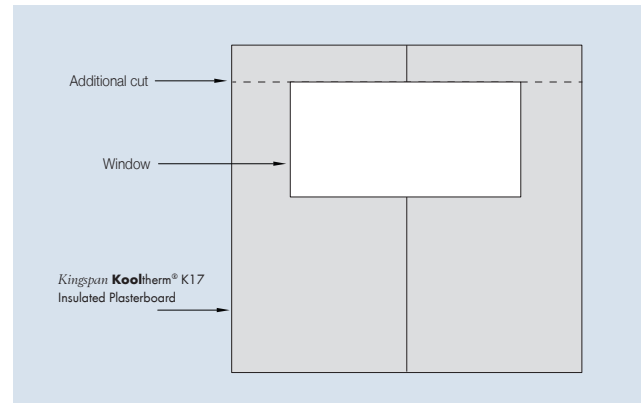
Kingspan Kooltherm® K18 Insulated Plasterboard Installation details for cutting
